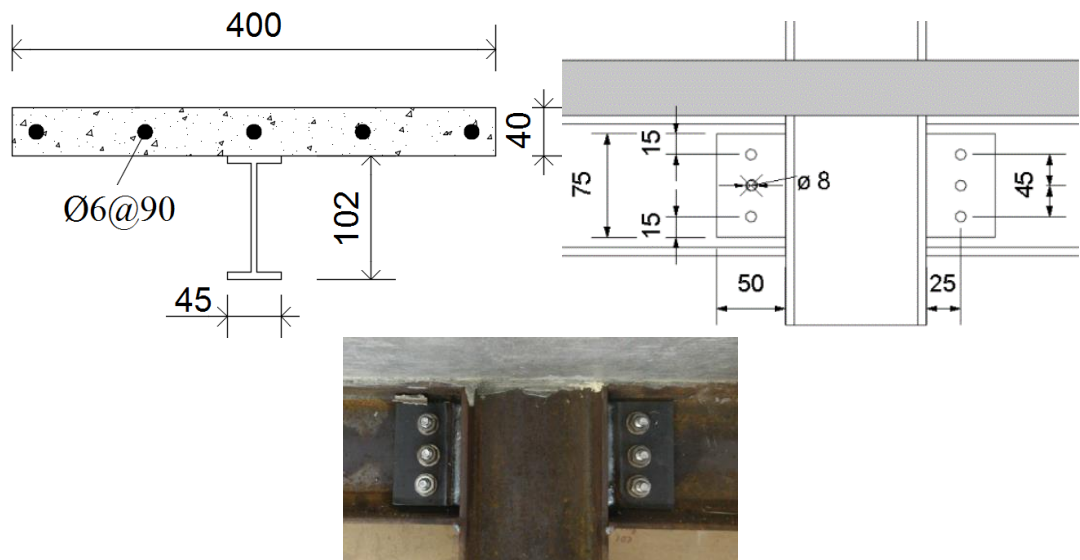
Specimen B3 with a typical bolted beam-column connection
